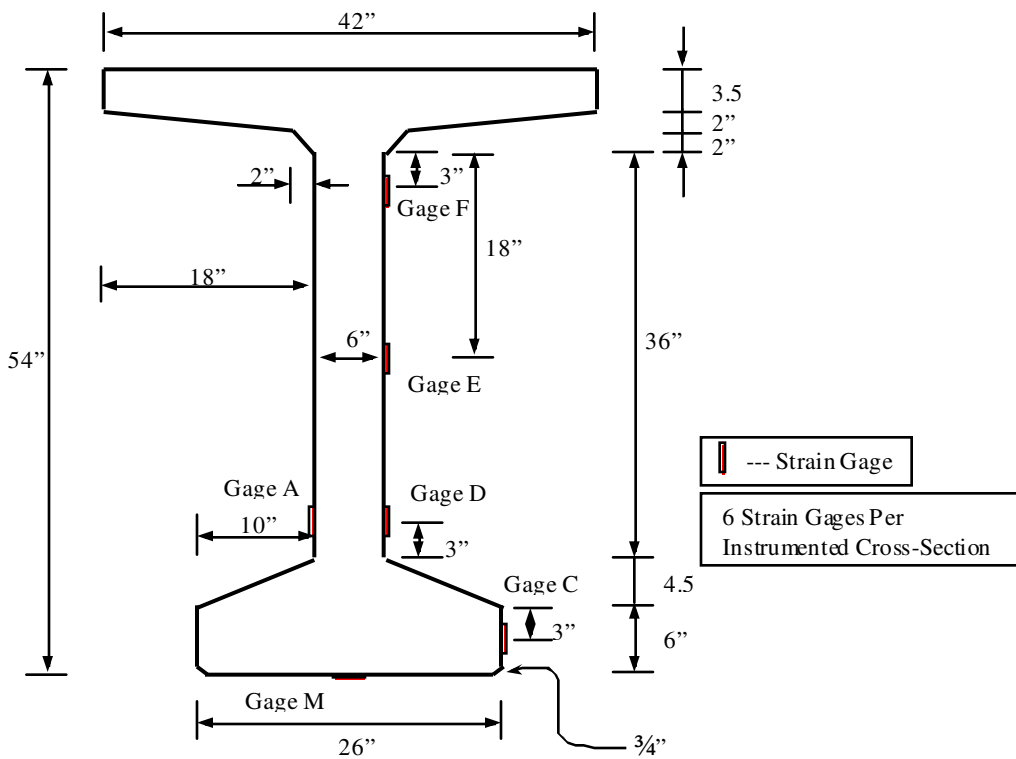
Strain Gage Layout - Span 10 and 11 Cross Section 2
